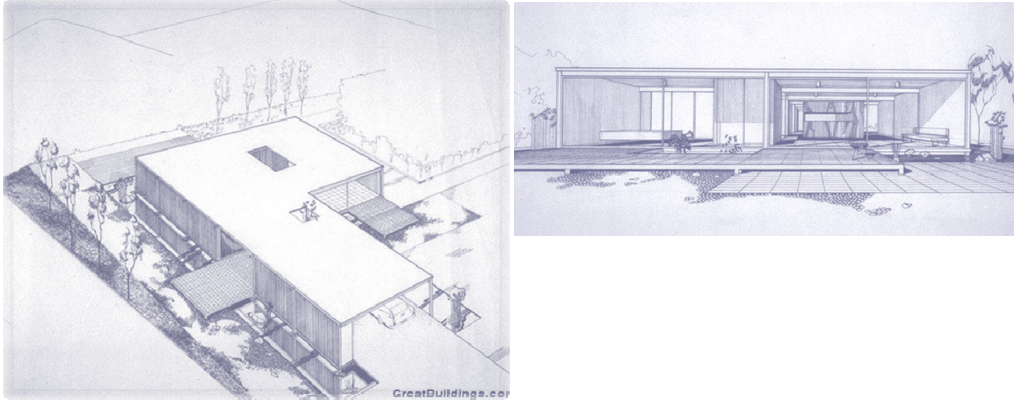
Case Study House #21, Pierre Koenig – West Hollywood ,Ca., 1958
